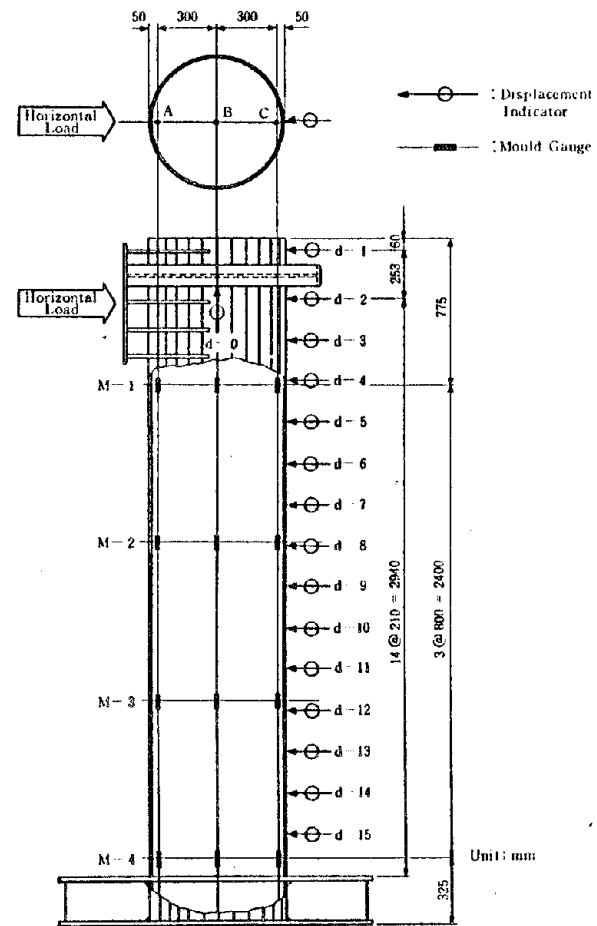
Position of Mould Gauge of Concrete and Displacement Measurement
